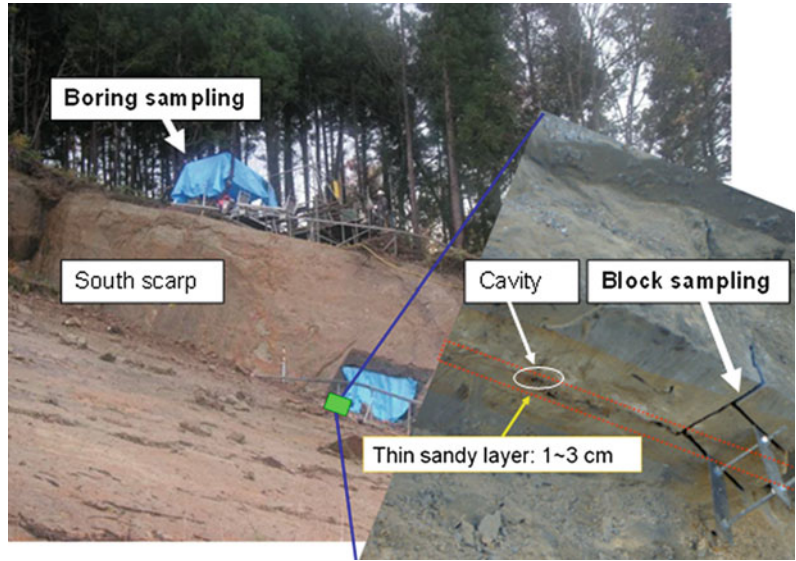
Failed slope at Higashi-Takezawa site (Slope 2; modified from Kokusai Kogyo 2004)
